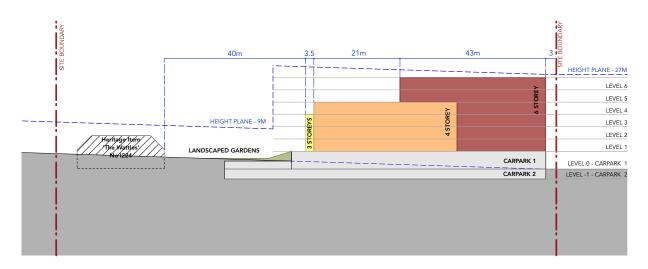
North Schematic Section - Building Envelope & Ground & Upper Setbacks
